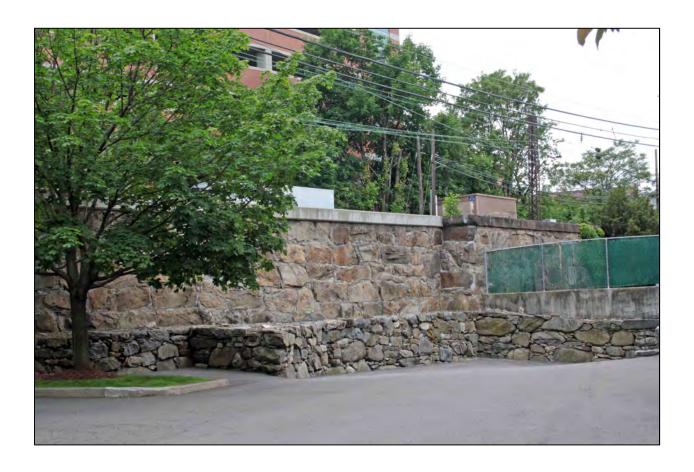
Retaining wall south of Marshall Street, detail of weep hole, camera facing east.
